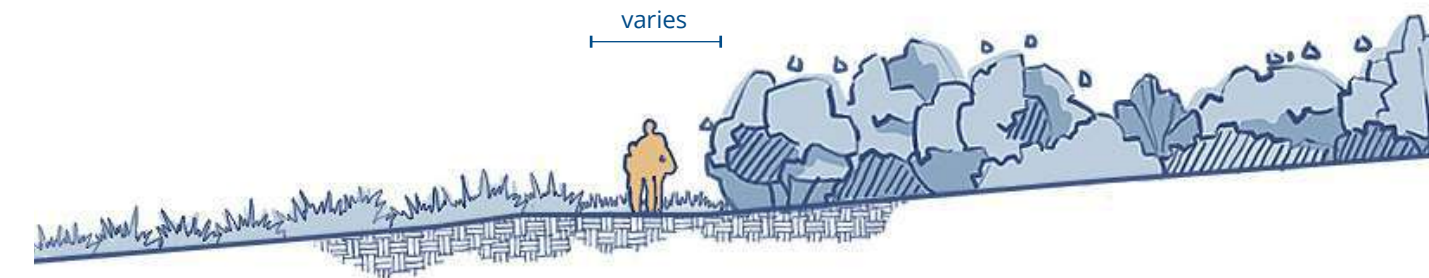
\_ Key diagram - Proposed footpath and highway construction details
